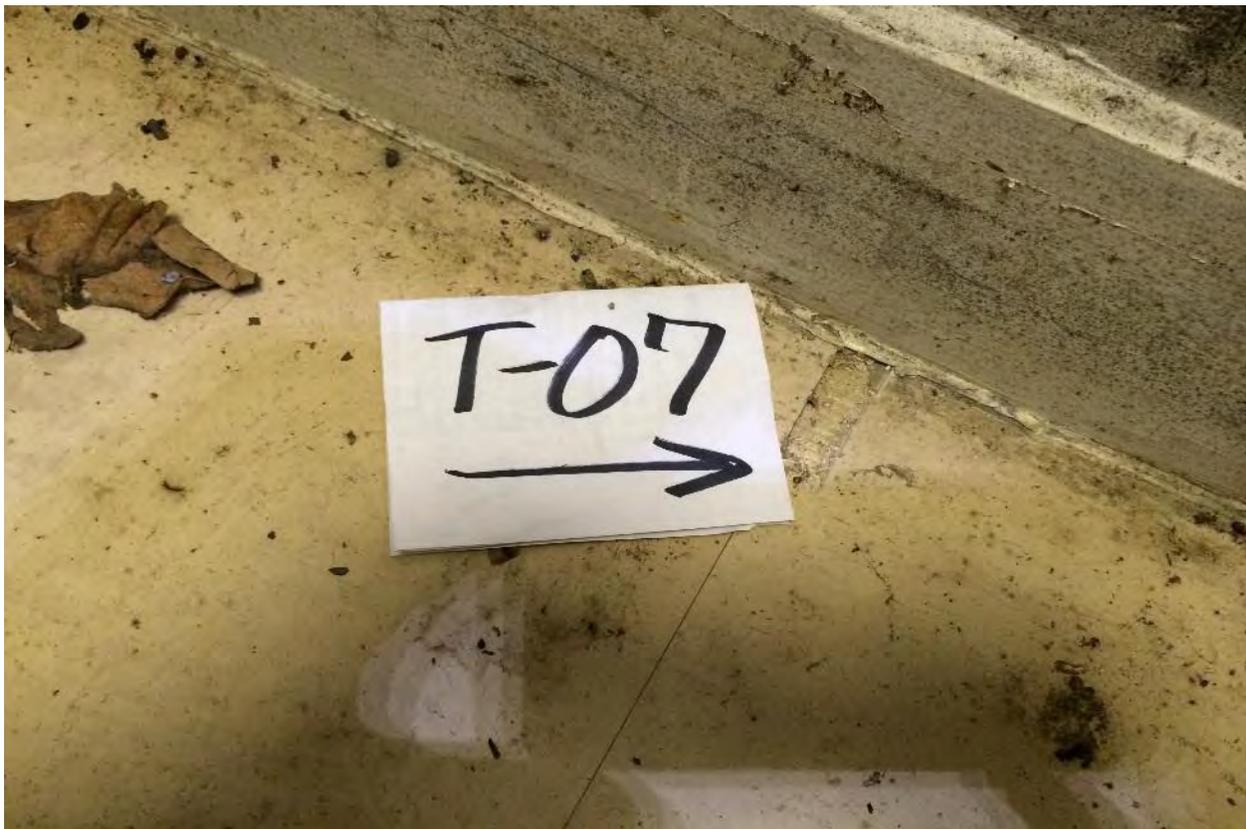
Laboratory analyses did not detect asbestos minerals within the beige floor tile or mastic sample TS-07 collected from the Theatre Building hallway.
